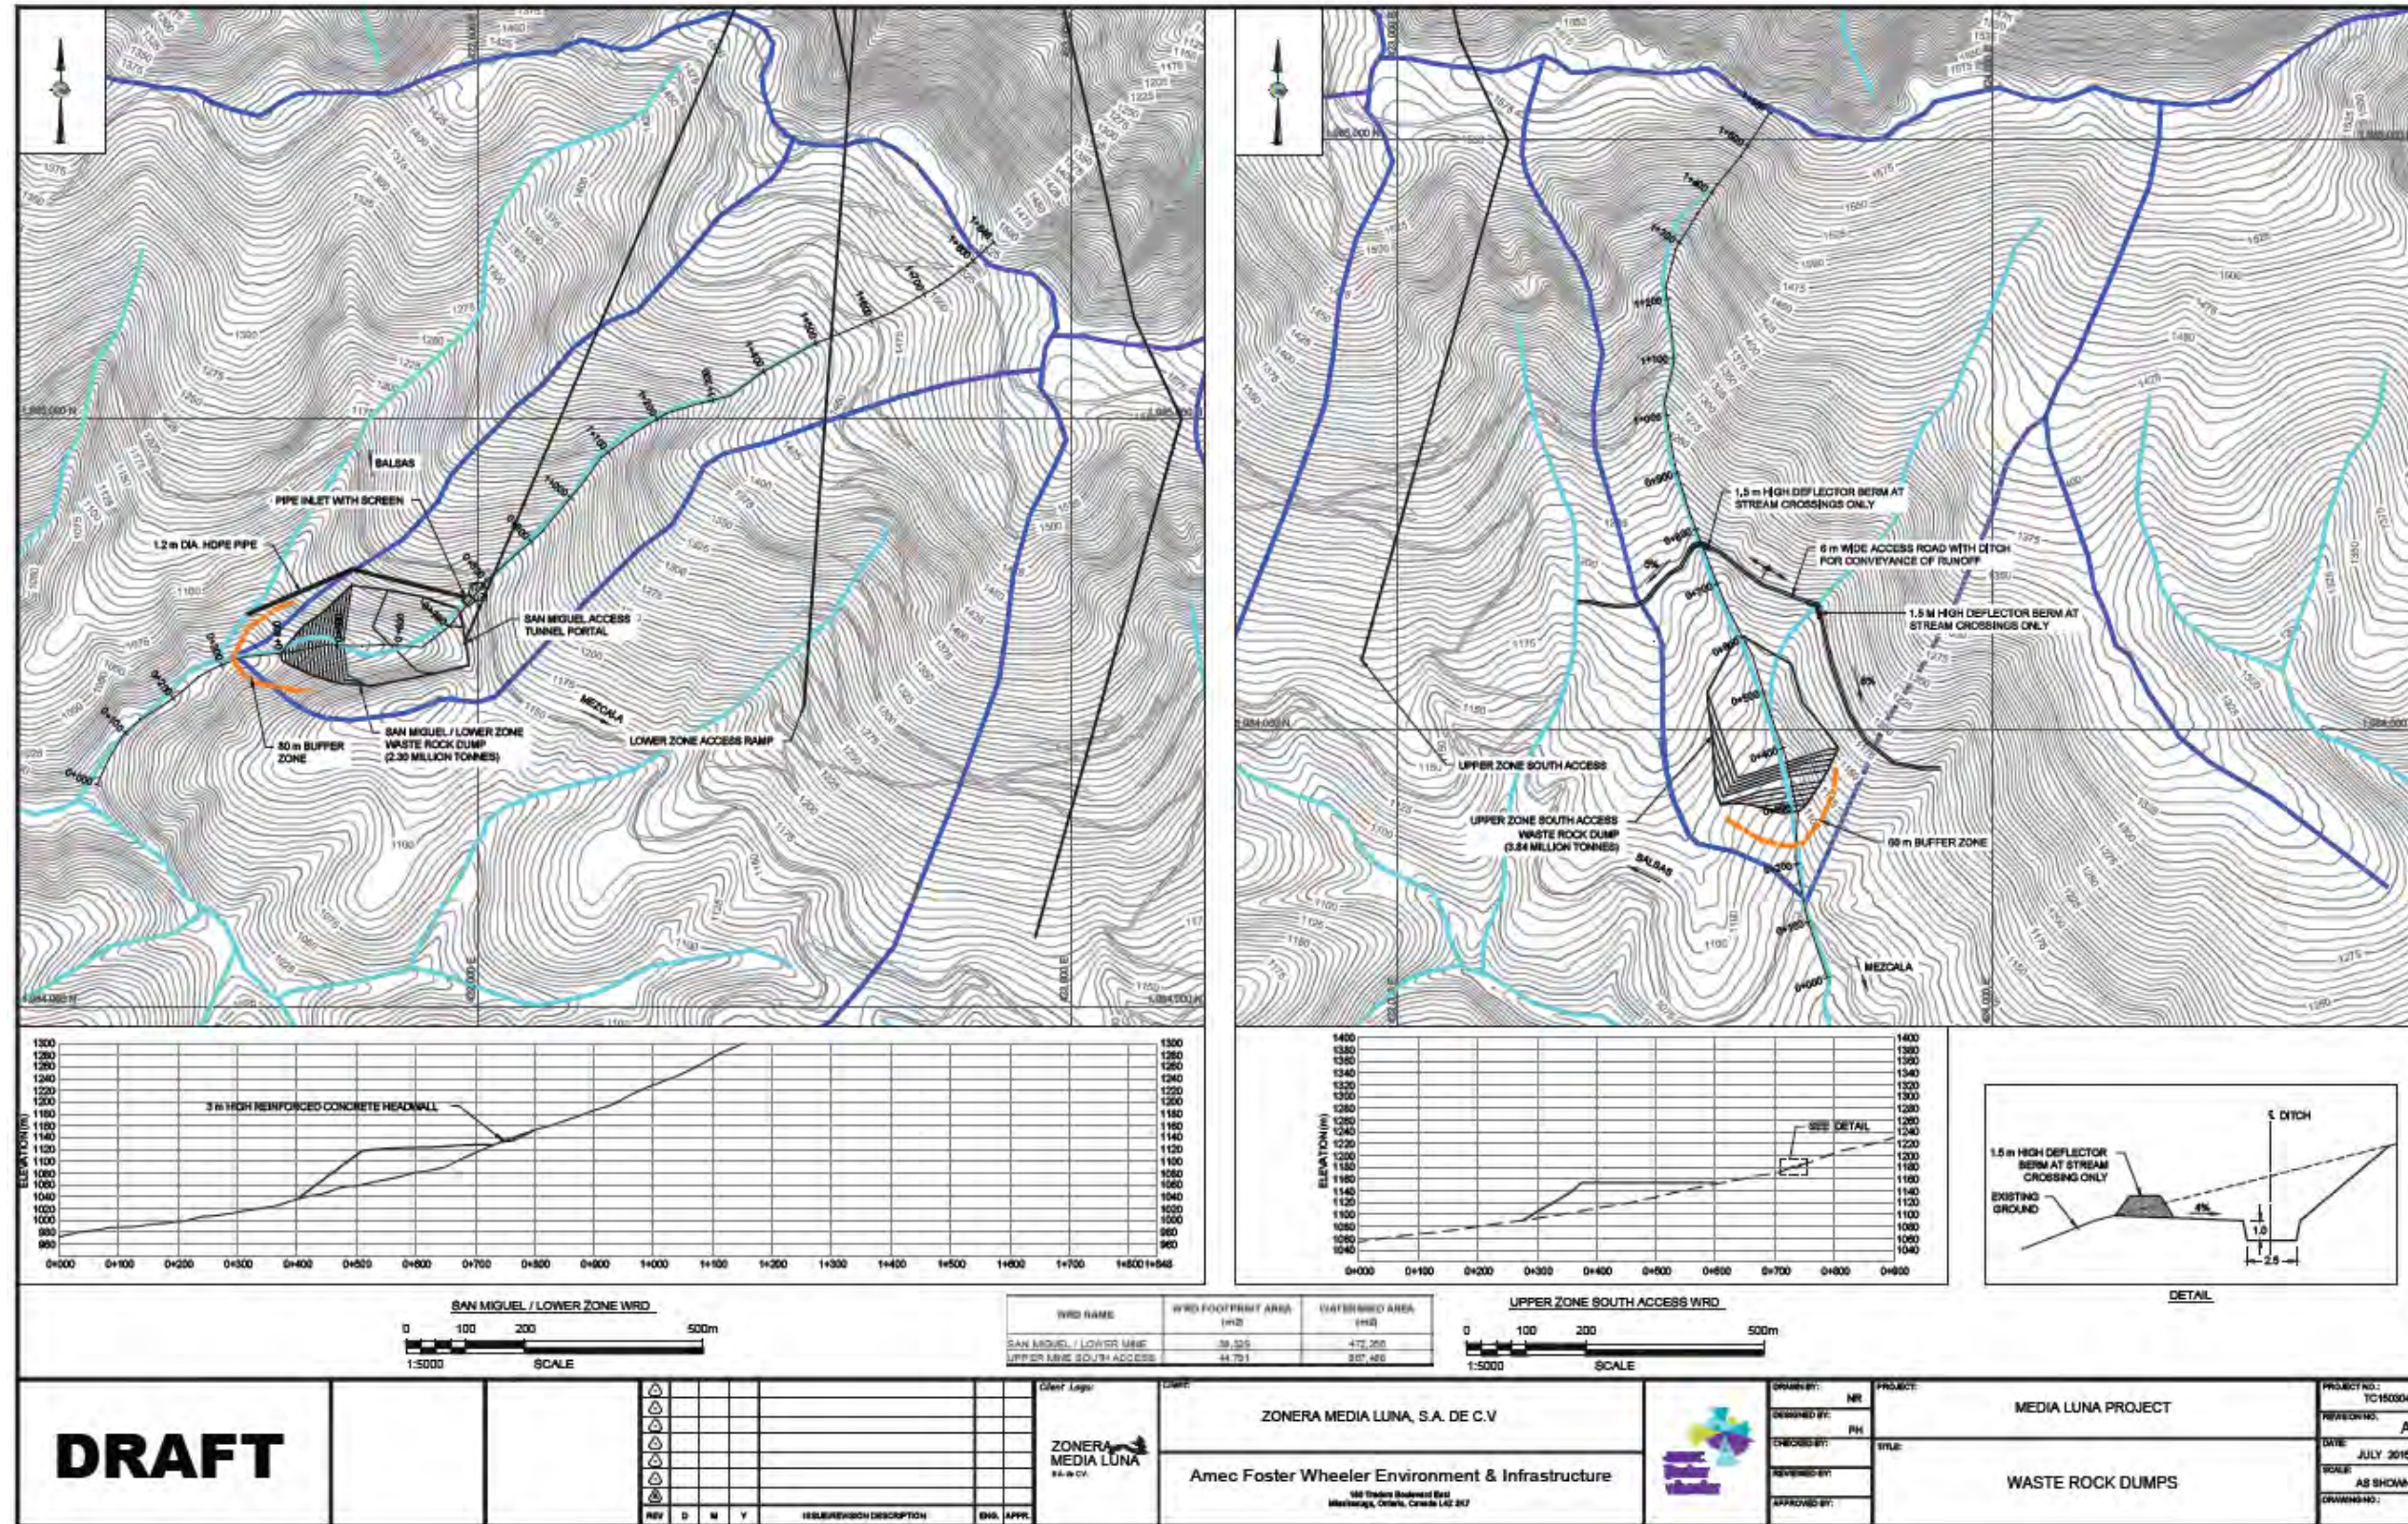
San Miguel and Upper Mine South Access Tunnel WRDs and Water Management
